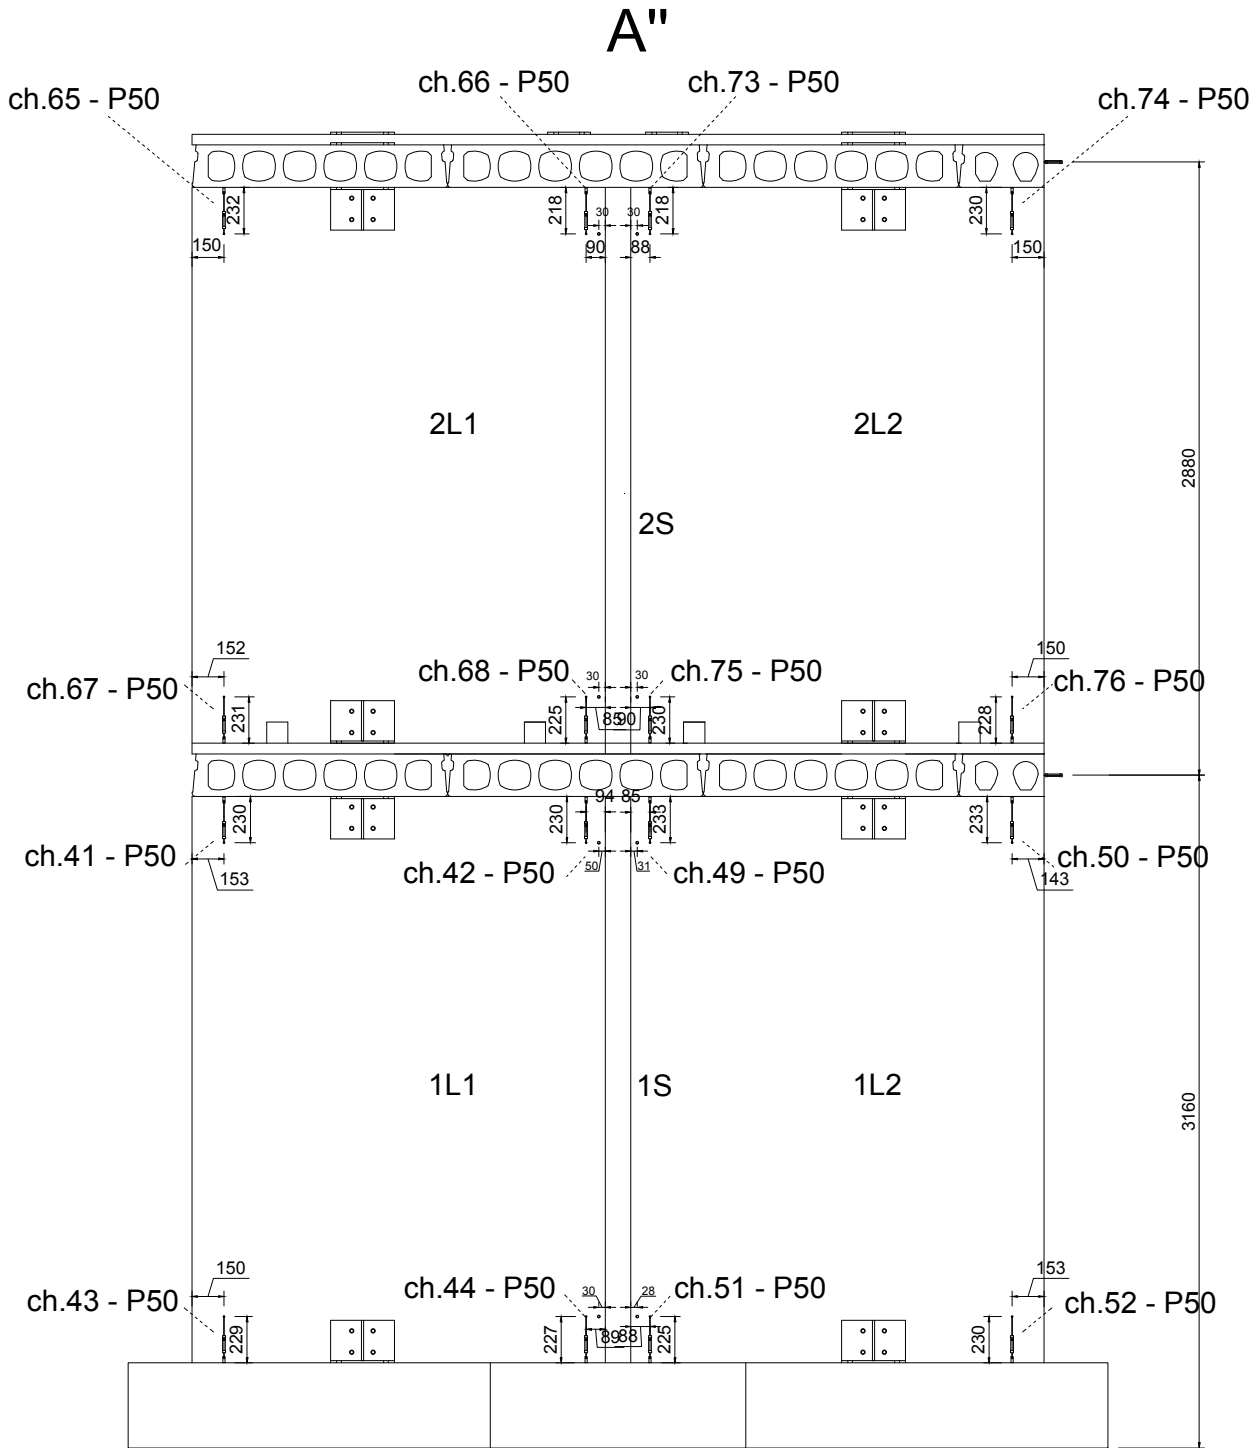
Schematic of the installed instrumentation: front views of the specimen – Lateral walls, A''.
